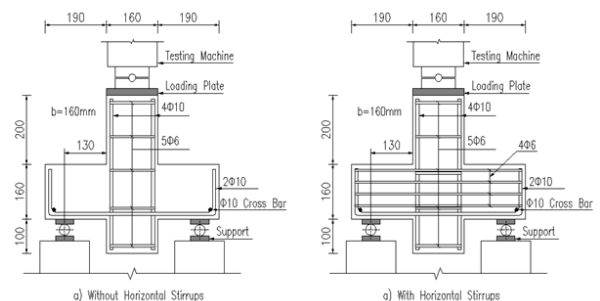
Corbels Geometrical and Steel Reinforcement Details[3]
